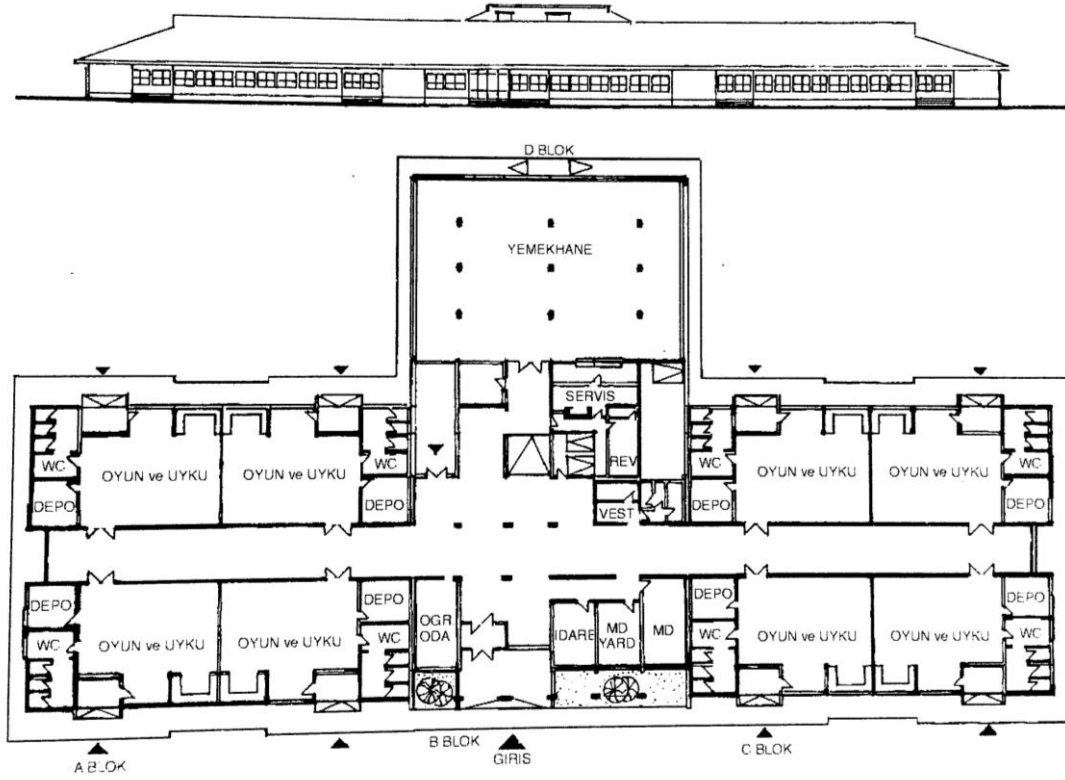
Gür (2002), Preschool structure up to 200 student capacity- plan and elevation – Type Project.
